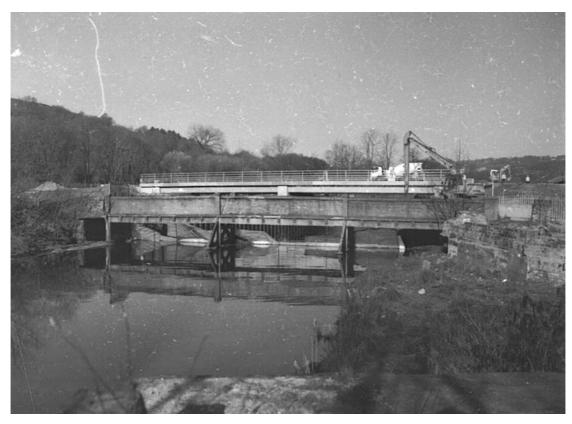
South-east-facing elevation of Sterne Bridge (MF SB01_04)
